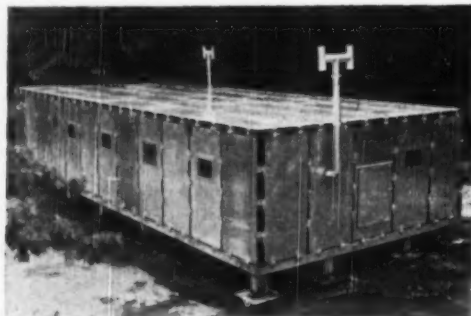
COMPLETELY ERECTED PREFABRICATED ALUMINUM BUILDING
